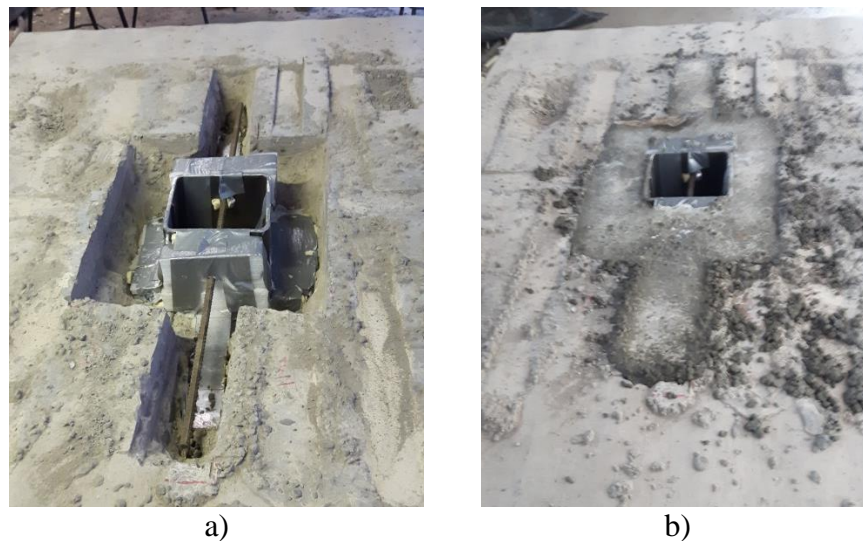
Specimen SP2A a) before casting; and b) after casting
